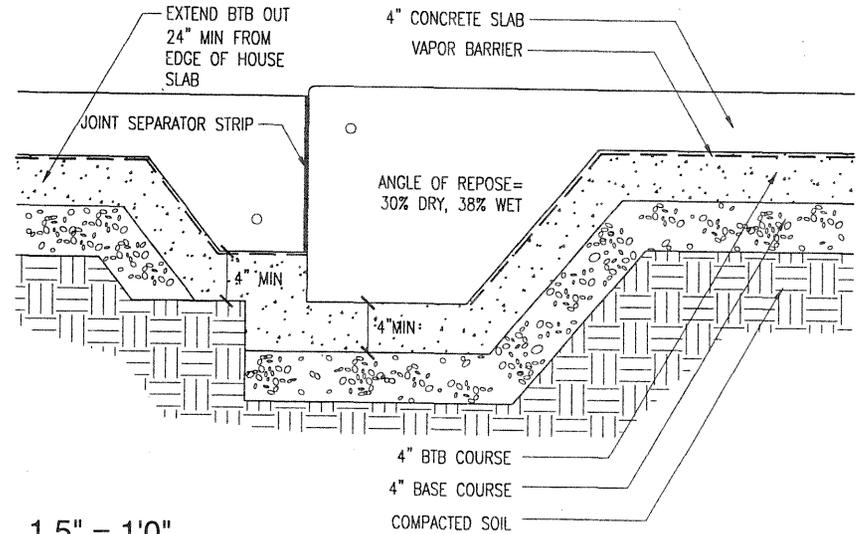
Typical monolithic concrete slab edge showing the BTB detail, the termination point of the vapor barrier, and the use of BioBarrier.
